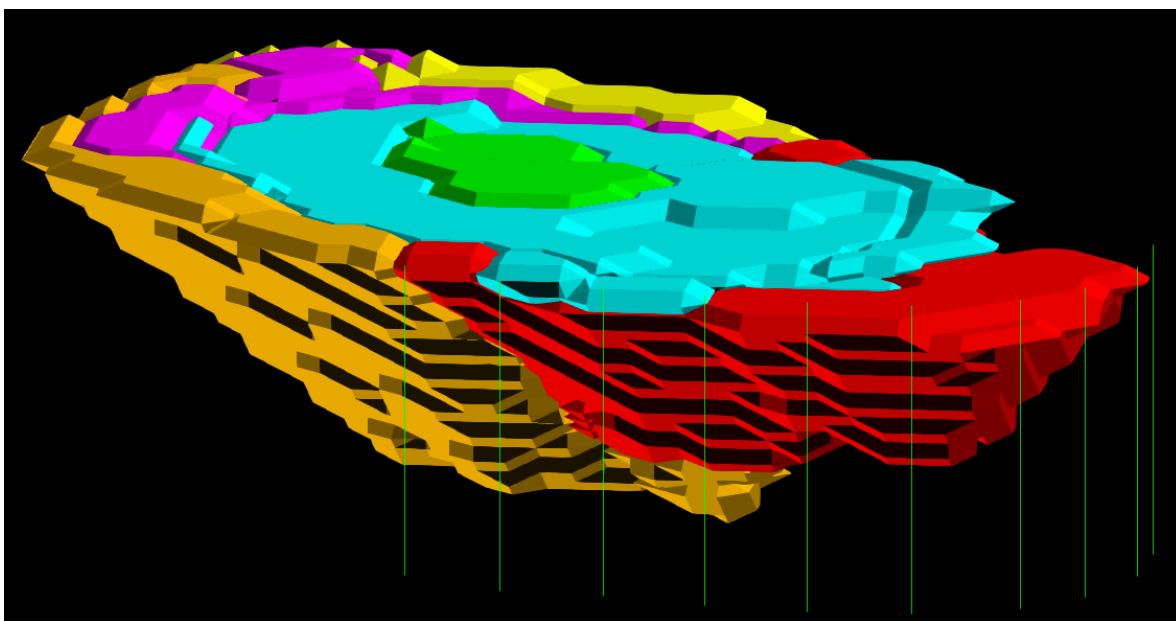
Final setup for instrumentation campaign in the South-East walls of the open pit
